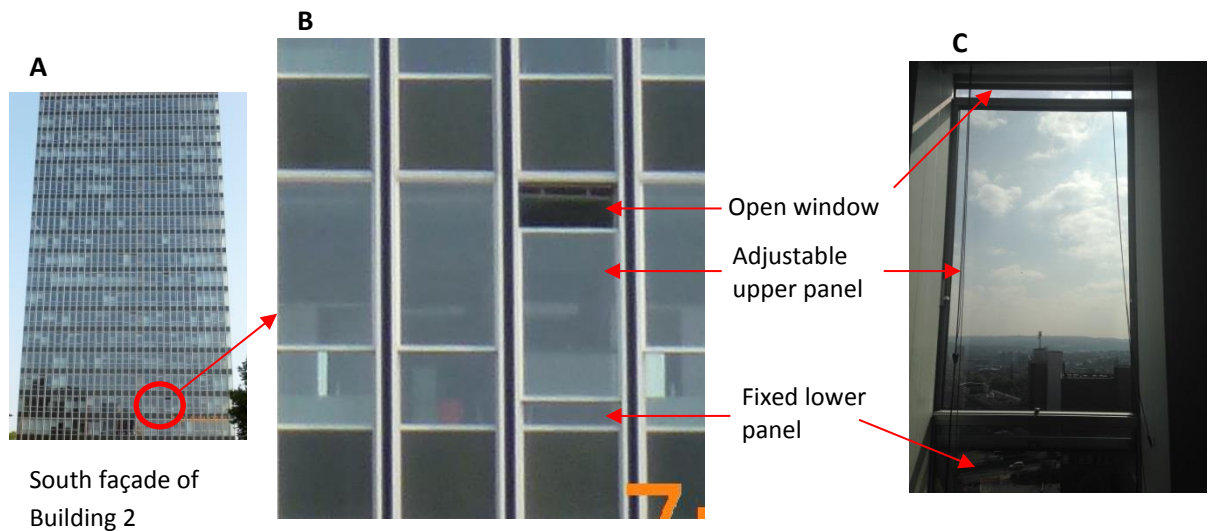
Façade of Building 2: (A) Elevation of south façade; (B) Open window as seen from outside and on a photograph; (C) Open window from inside Building 2
